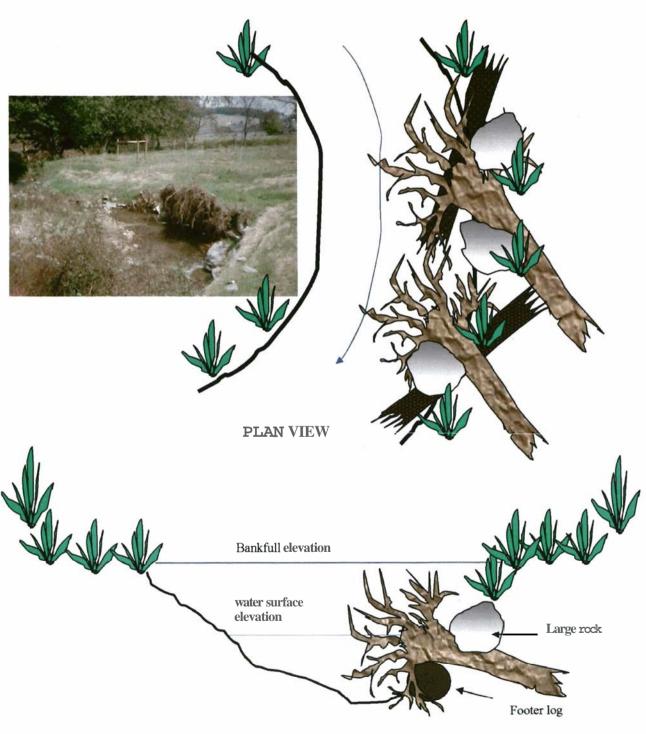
Typical root wad structure showing plan and cross section views. NOTE: Footer logs should be >8" diameter and installed below the streambed. Root wads should be 8-14 ft long and >10" diameter. Large boulders should be placed in gaps between root wads. Fill materials from the site should be placed behind the root wadsand boulders, covered with an erosion control met and seeded and trees planted on top of the bench.
